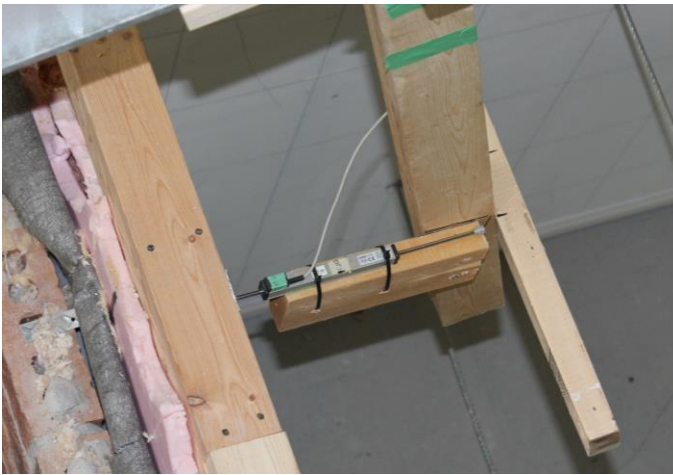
LVDT NE1, with the wood beam from the steel reaction frame.
